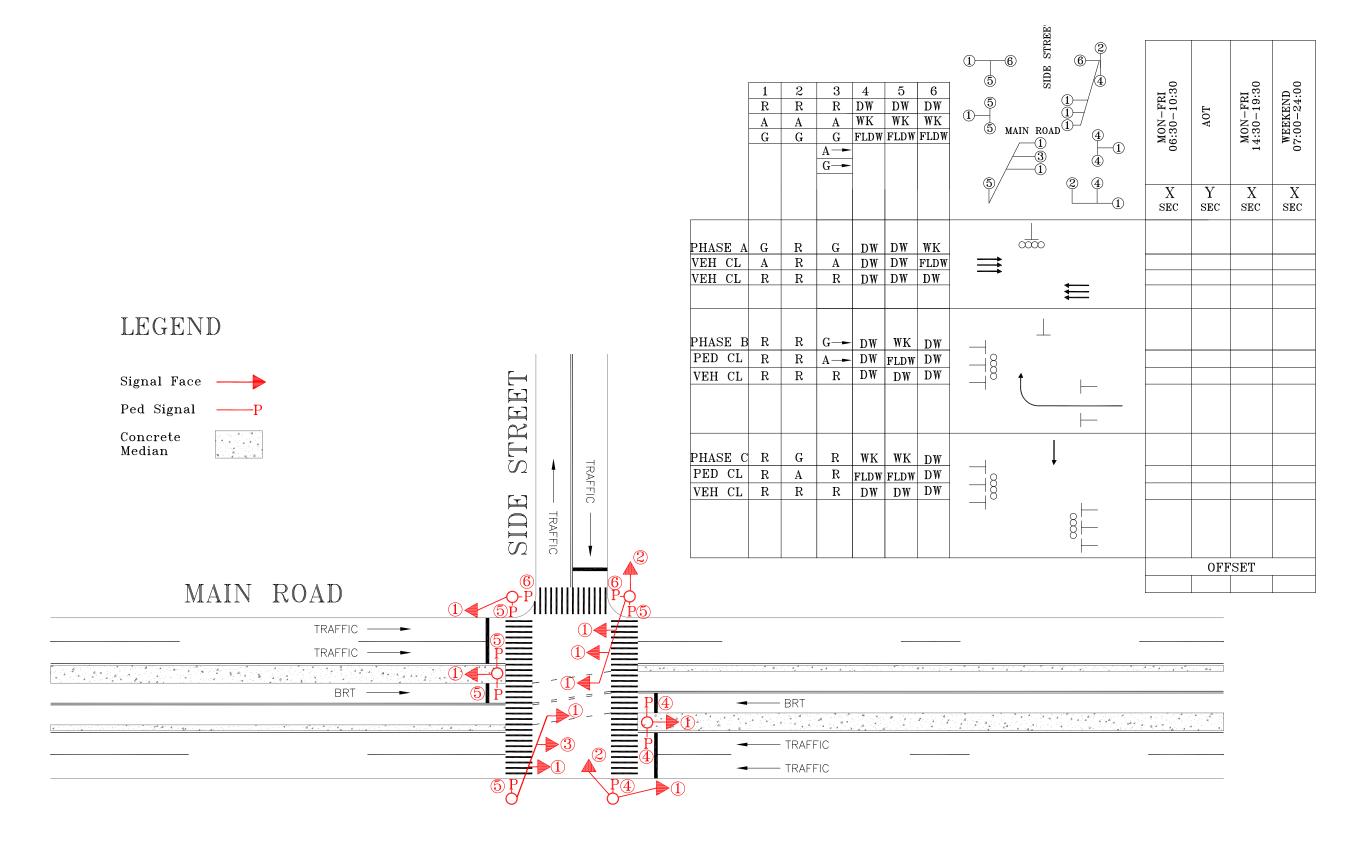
Traffic Signal Layout for 3 Legged Intersection
